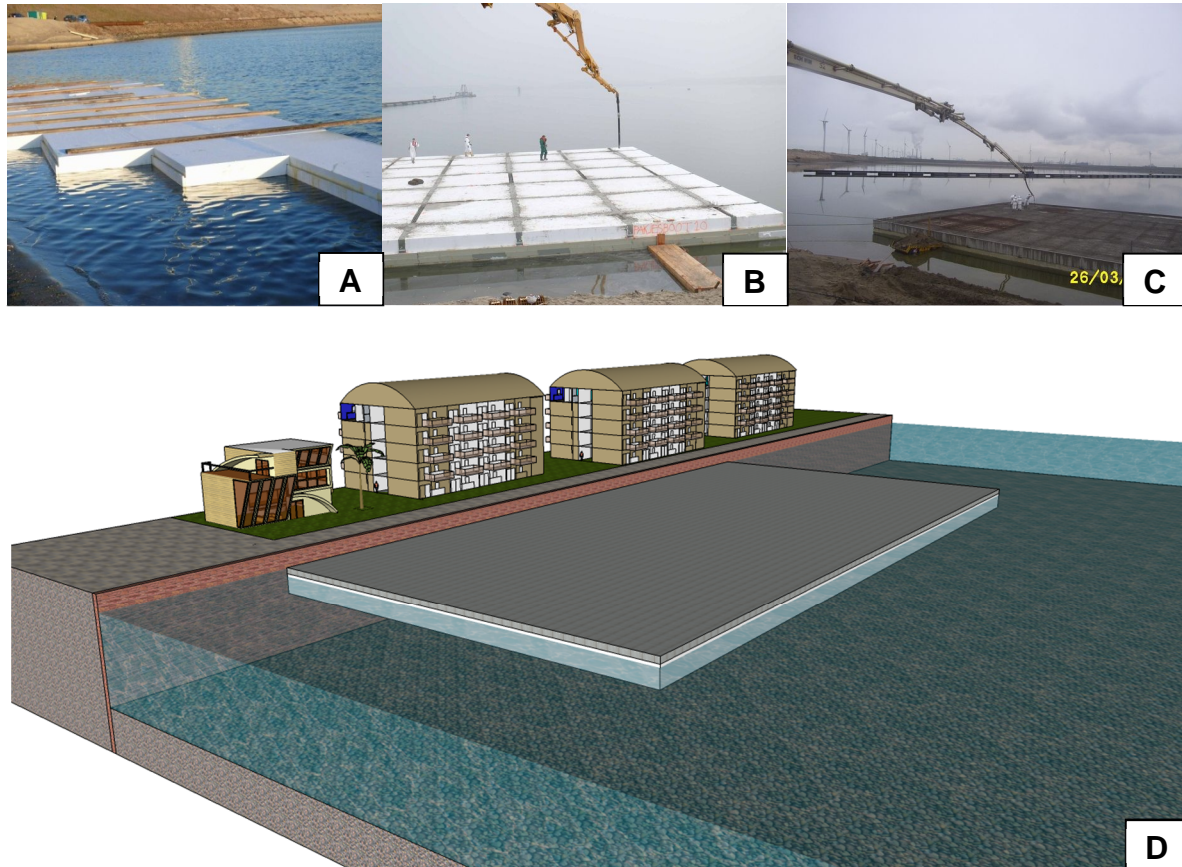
Stages of constructing the floating floor [www.flexbase.eu]
